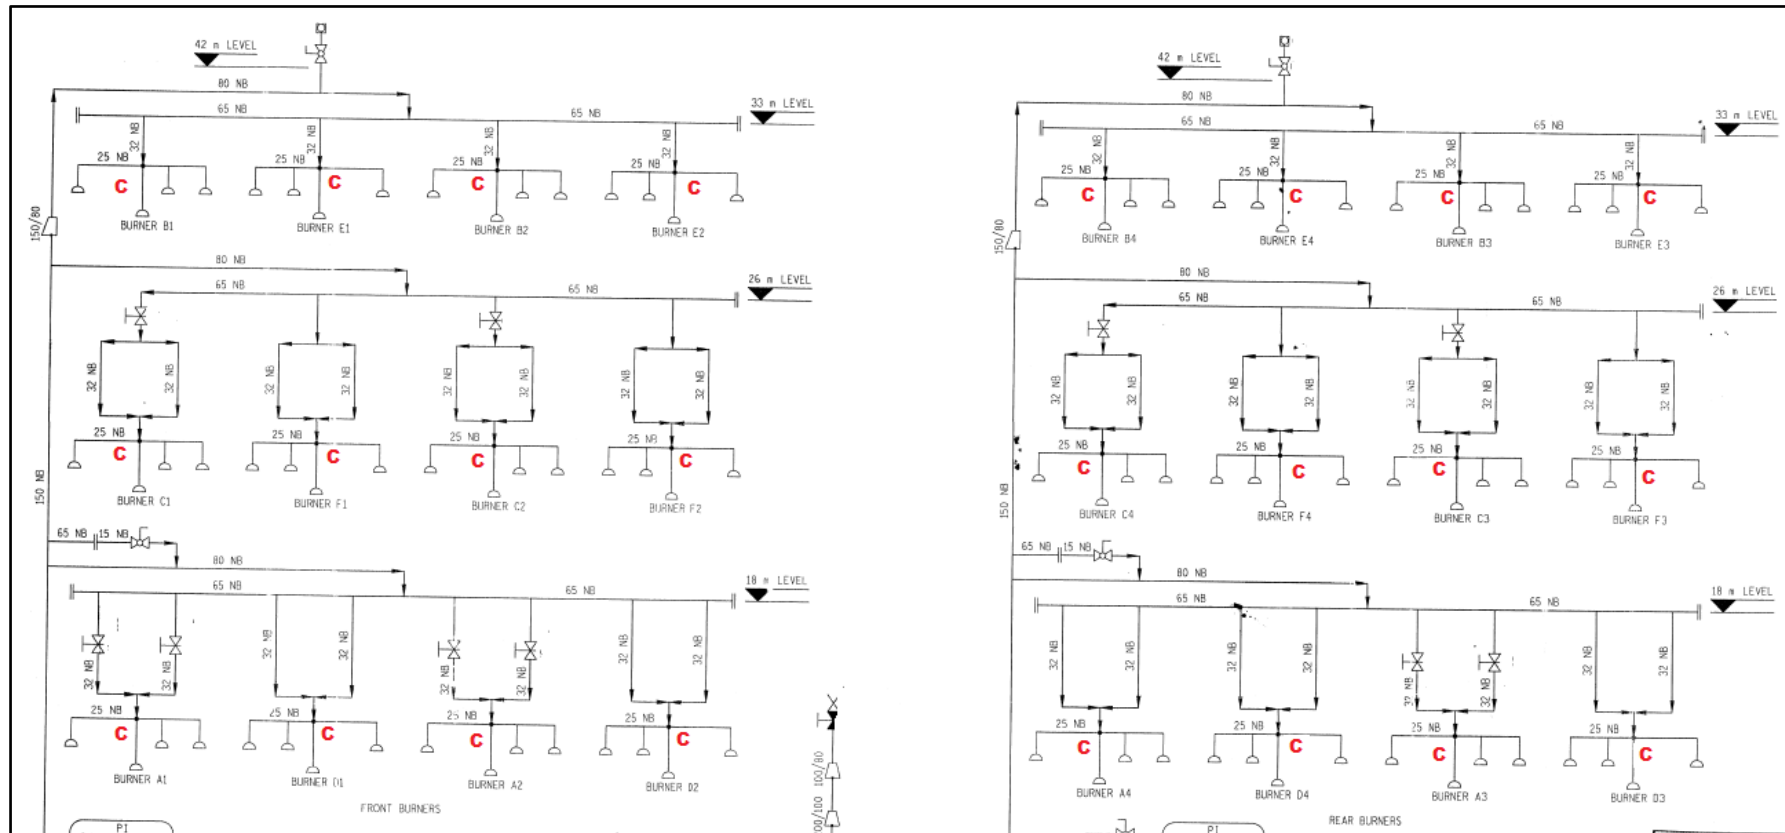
Unit 1 Boiler Burners MJC Locations [51]
